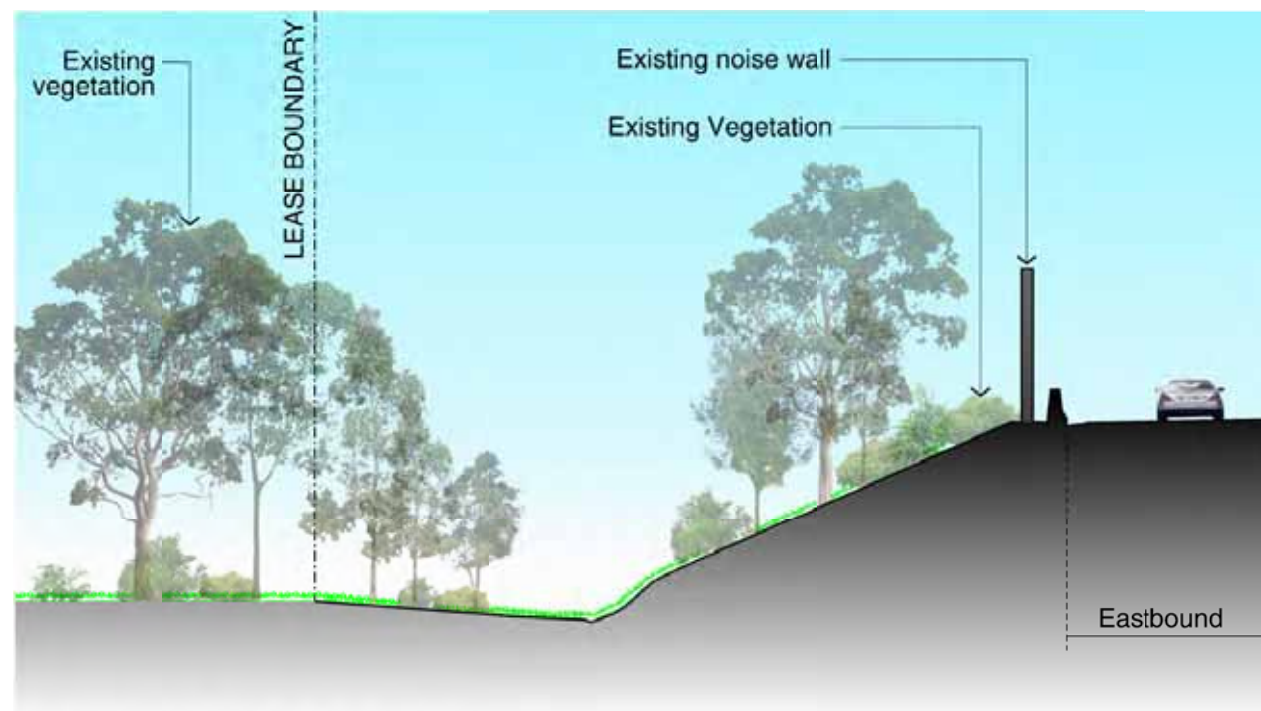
Stn 3750 Windsor Road off-ramp (eastbound) - Existing
